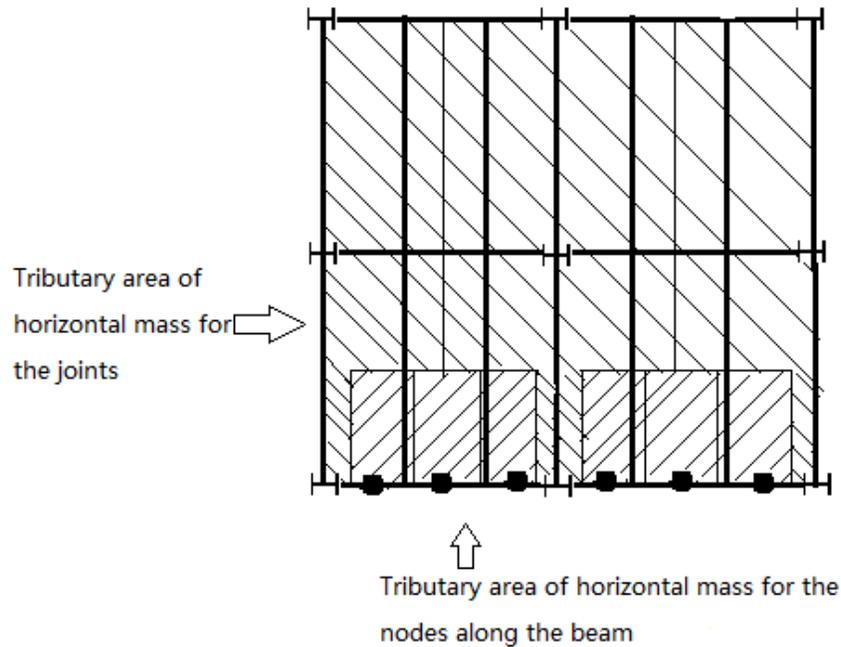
Detail of Tributary Area of Horizontal Mass in the Moment Frame as Girder Model (two bays)
